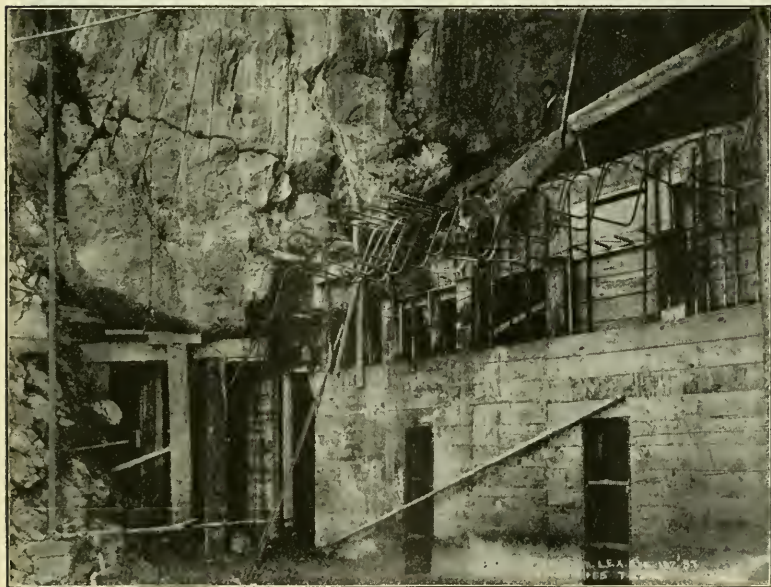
ROCK CONDITIONS AT 102D STREET PORTAL.
